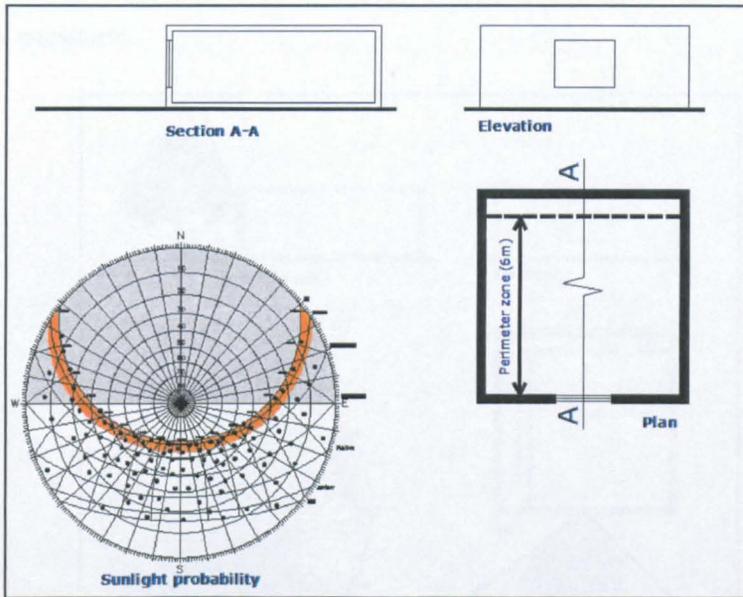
Plan, elevation and section of a classroom which faces the south and is not overshadowed by any tree or building.
